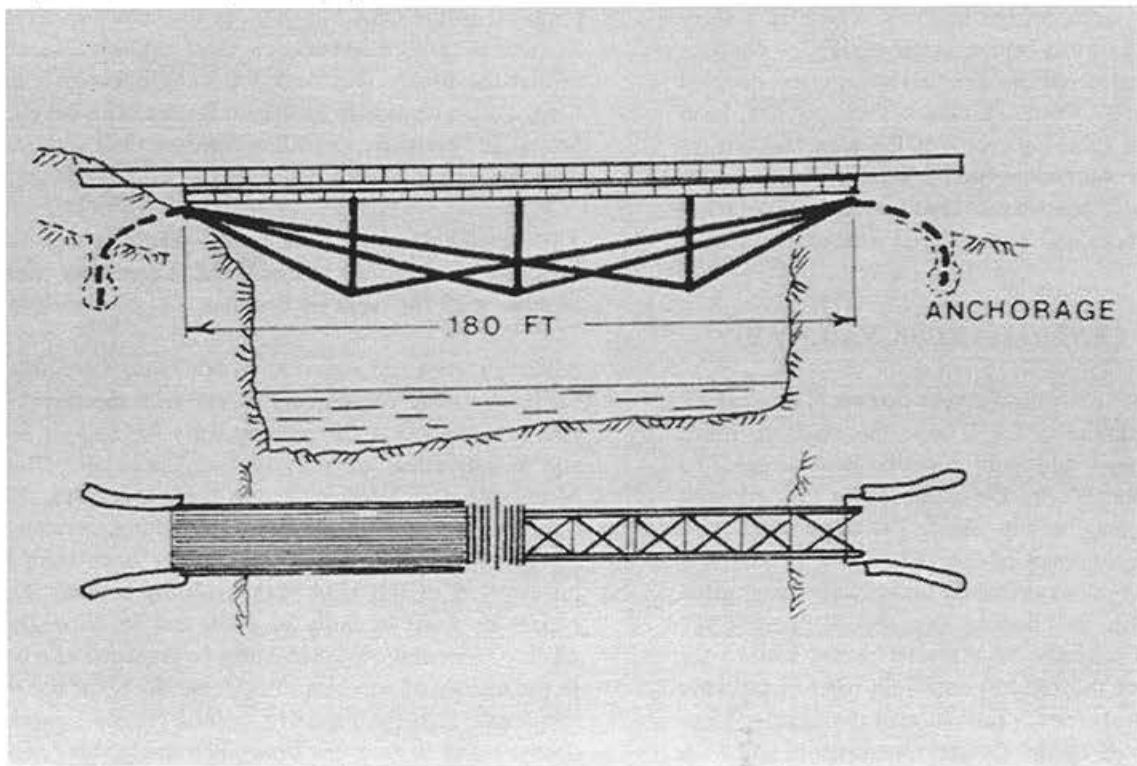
Outline Plan and Elevation Rakaia Gorge Bridge
